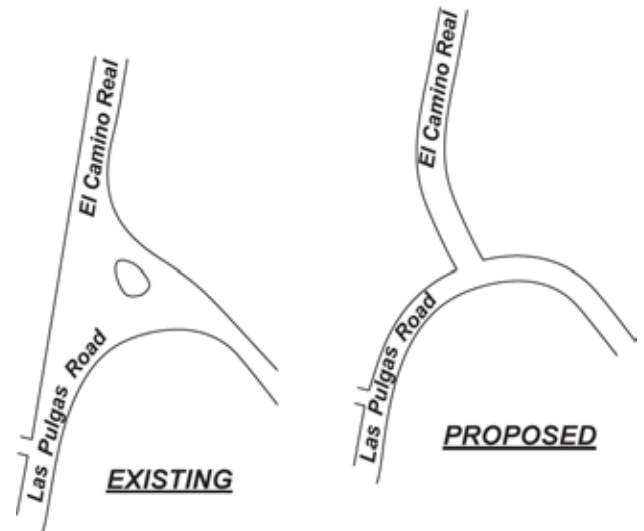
Proposed redesign of Las Pulgas Road and El Camino Real intersection near the guard house.
